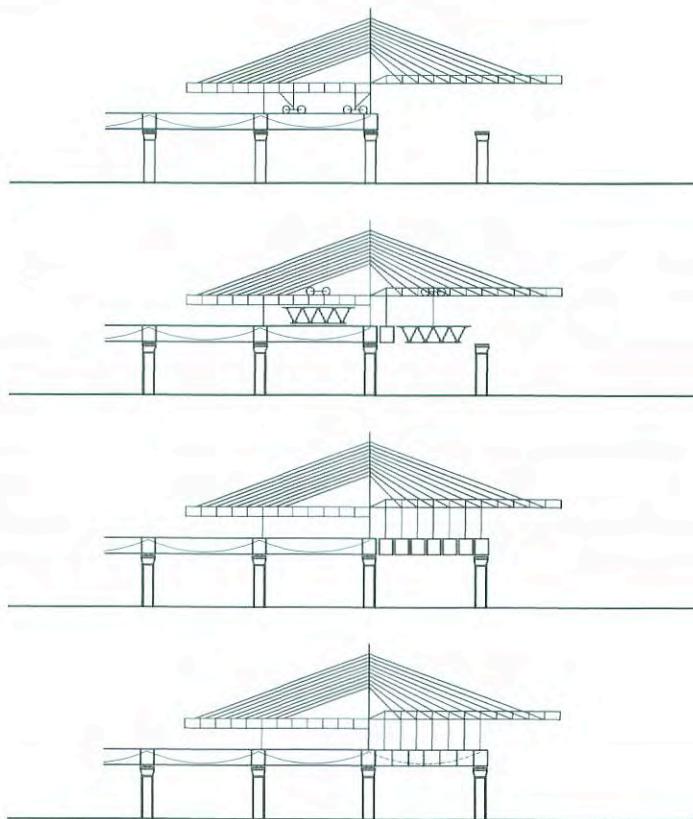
Launching gantry to support precast elements – Bubiyan bridge, Kuwait
